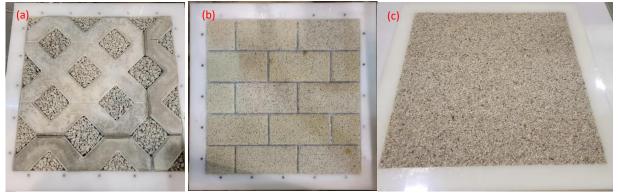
Pictures of permeable pavement trial slabs with a size of $0.5 \text{ m} \times 0.5 \text{ m}$ built in the laboratory. (a) refers to the trial slab made of open cell paver (OCP), (b) refers to the trial slab made of porous paver blocks (PB), and (c) refers to the trial slab made of resin bound surface (RBS).
